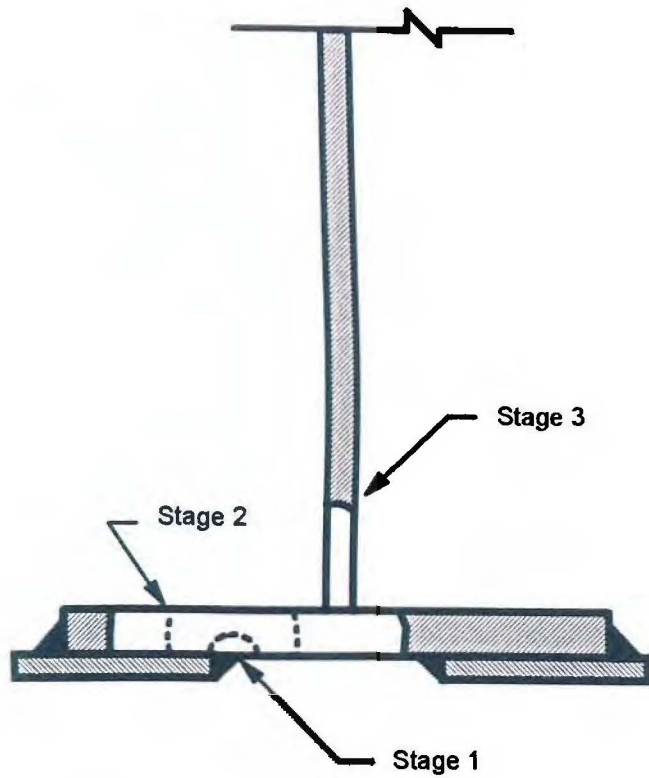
Stages of crack growth for attachment welded to flange.
